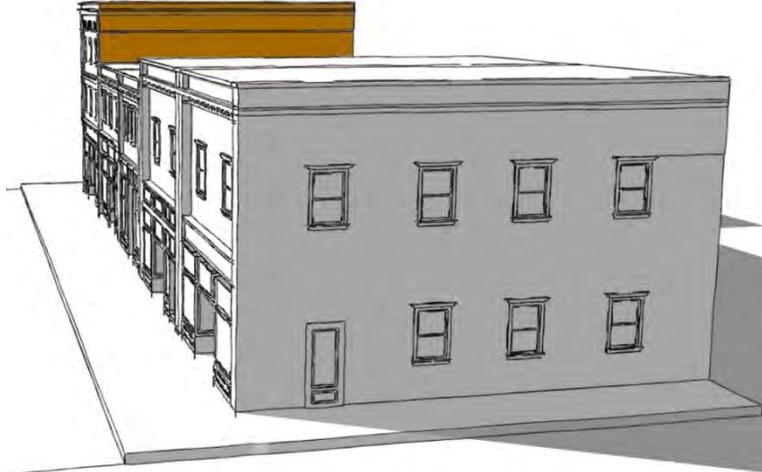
SECONDARY /CORNER SIDE FACADE
